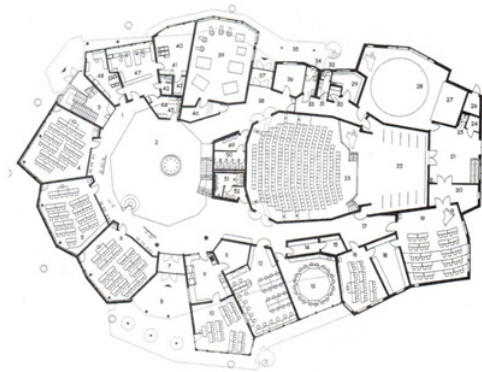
Ground floor plan(Waldorf School, Chorweiler, Cologene)(Architecture of School. p.228)
